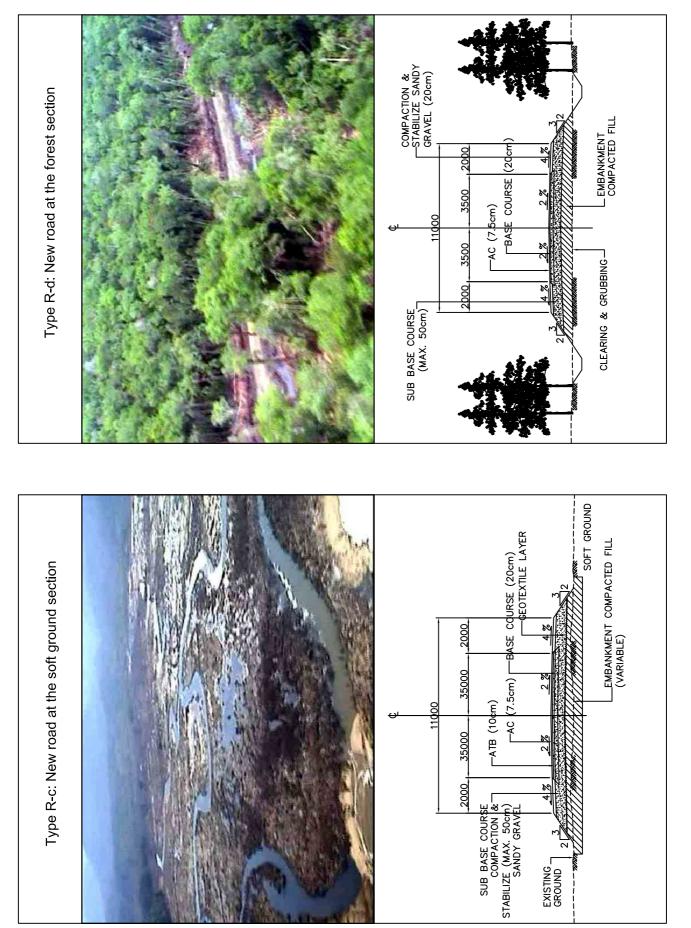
(4/5) TYPICAL CROSS SECTIONS
